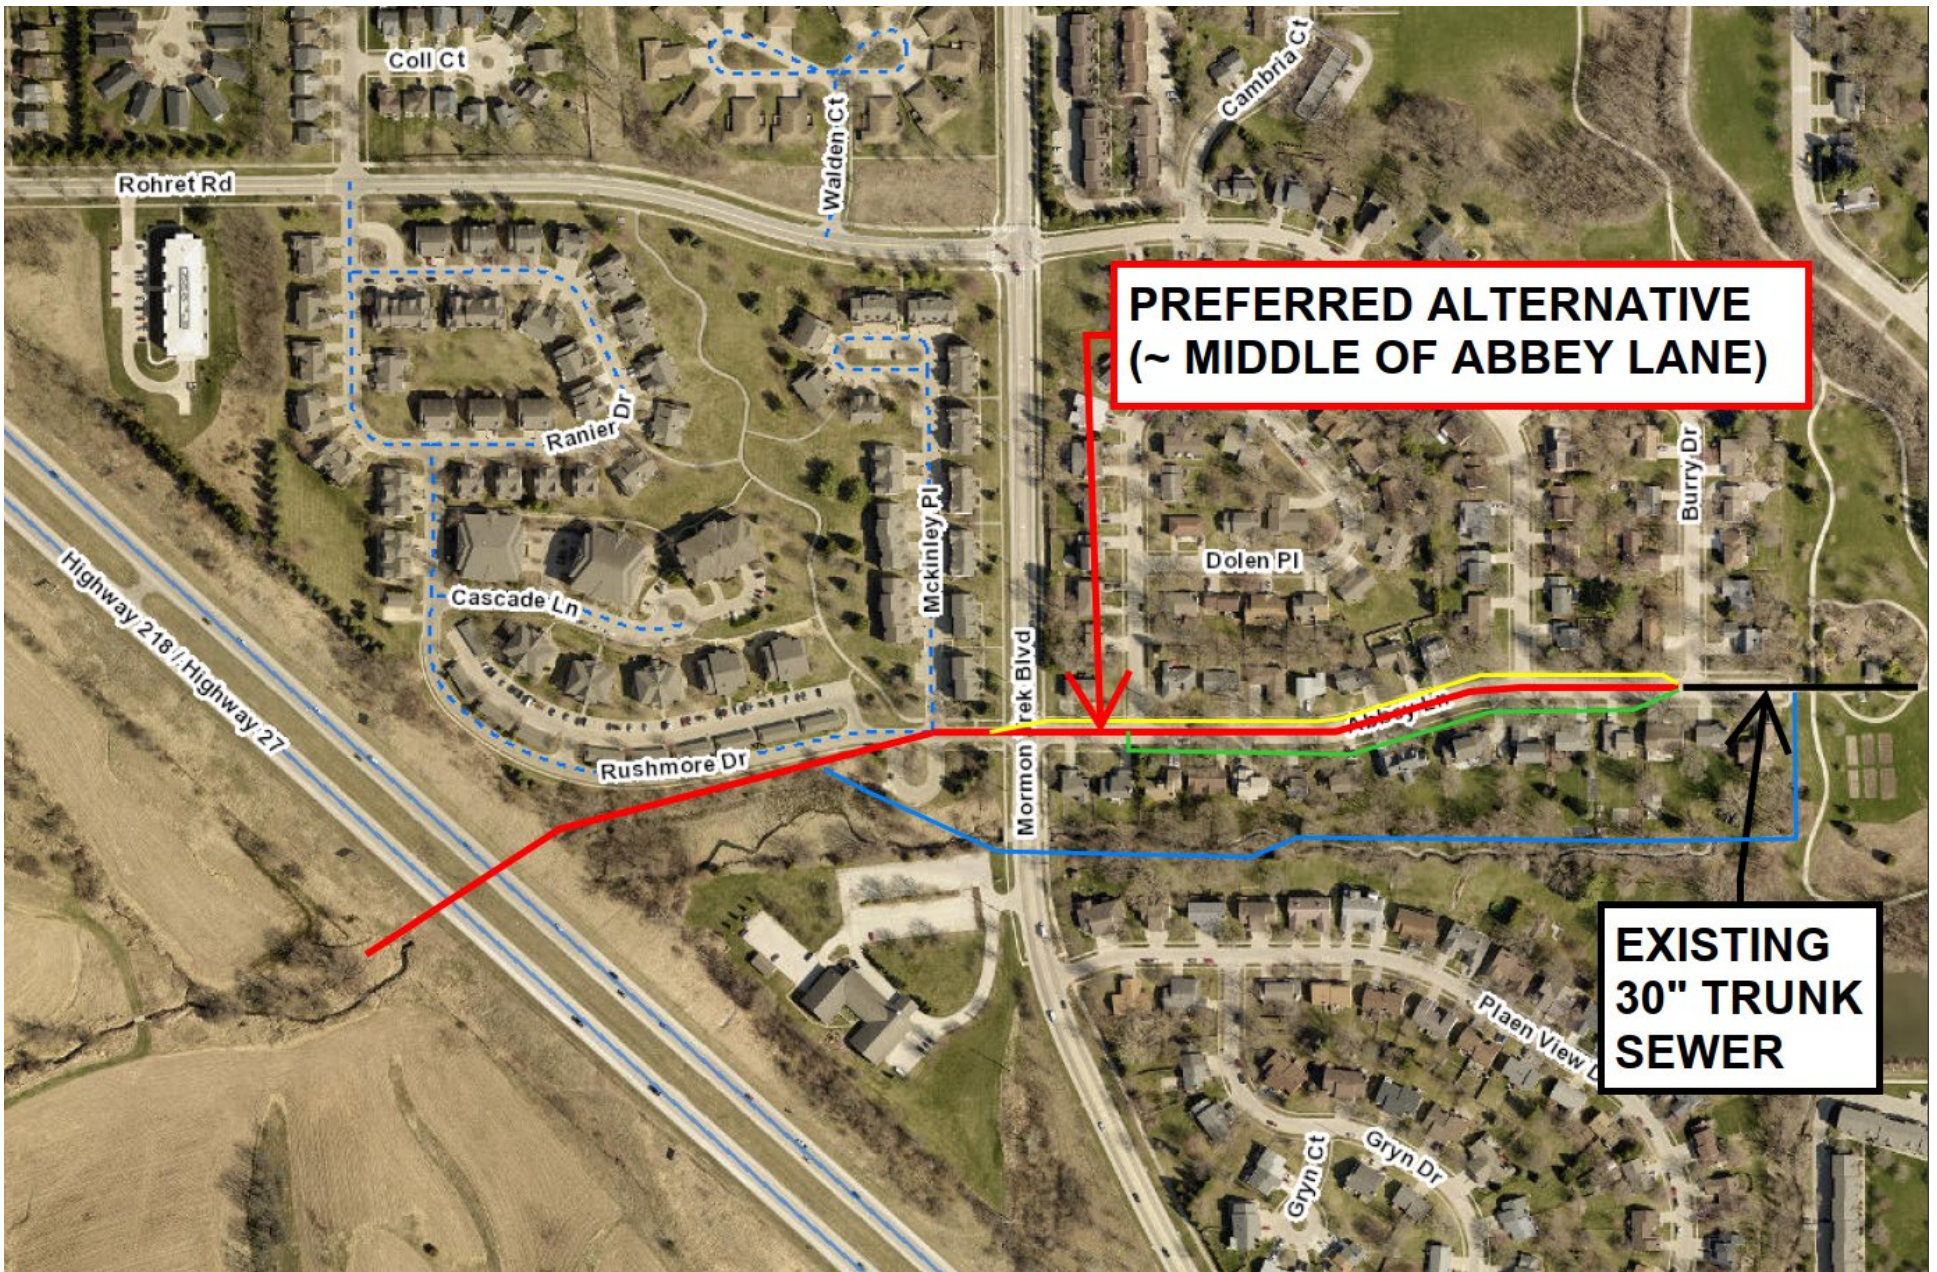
Alternative Routes for Proposed Trunk Sewer
